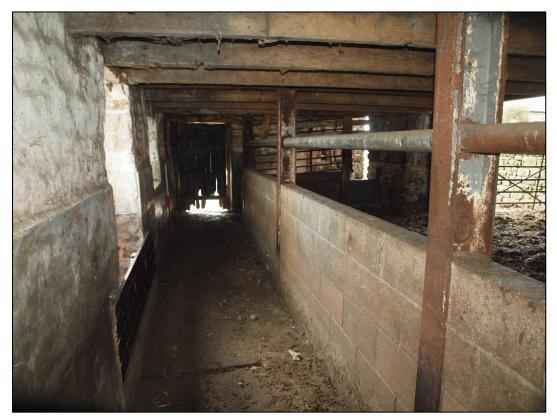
Inserted feeding passage along northeast wall, looking southeast
